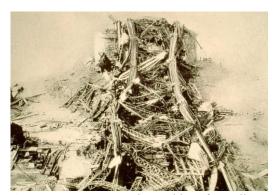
Cooper's Quebec Bridge after collapse
